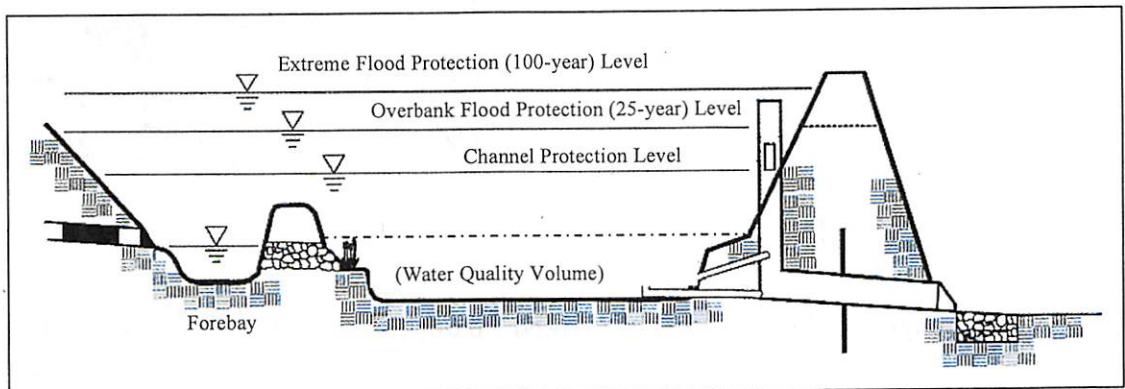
Unified Sizing Criteria Water Surface Elevations in a Dry Pond
